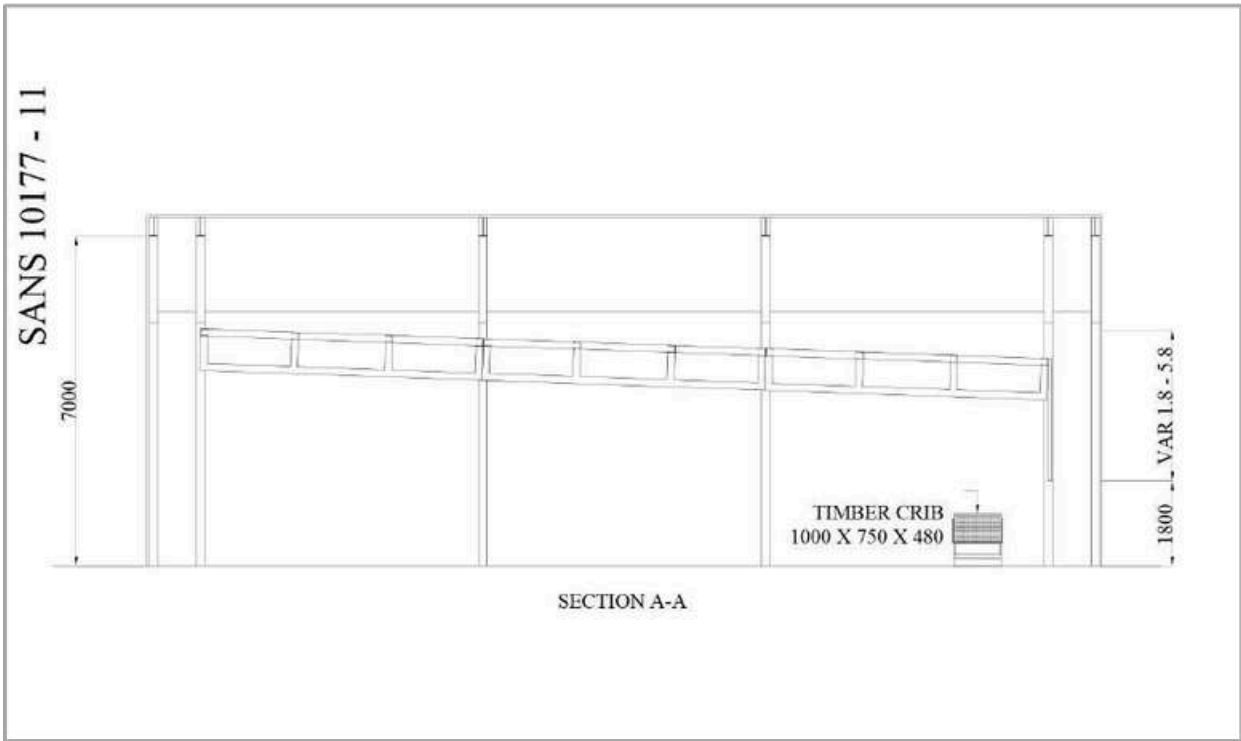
Typical roof test installation in the SANS 10177 – Part 11 facility
